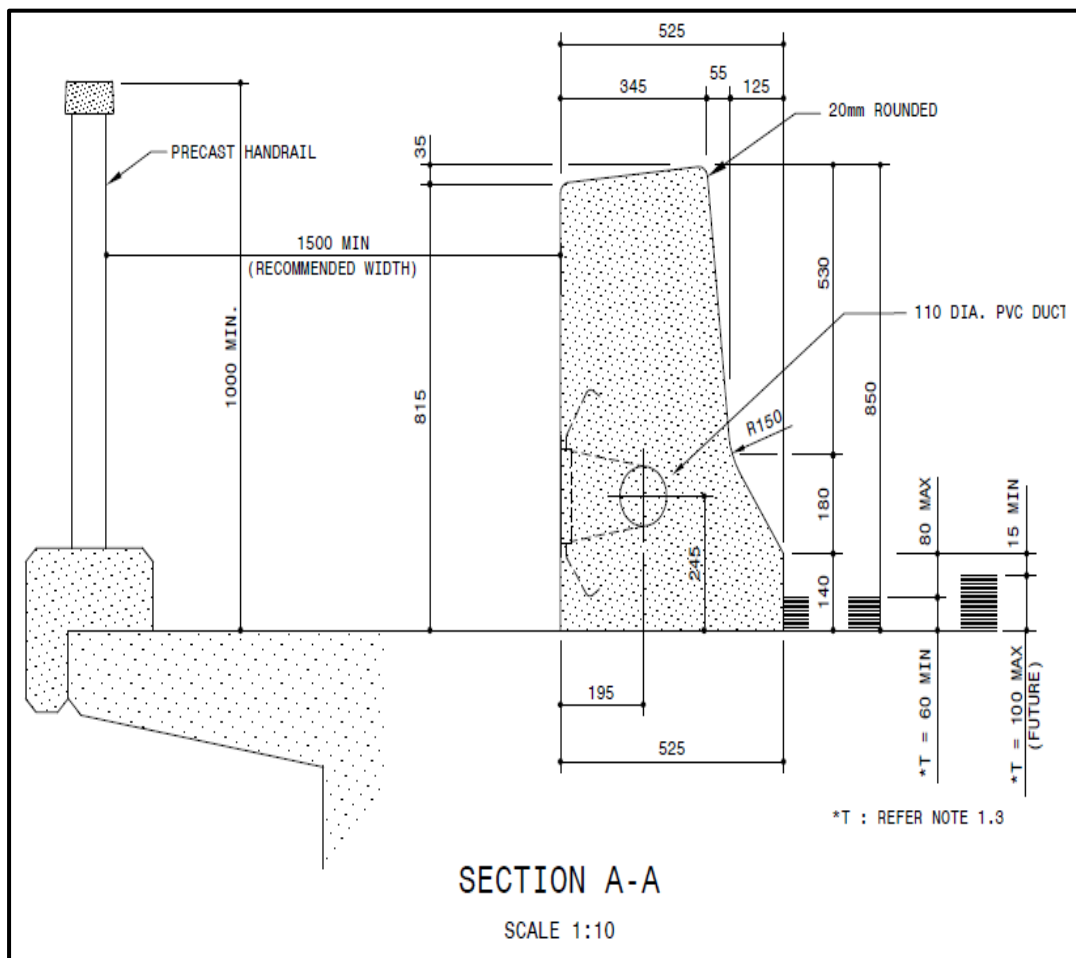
F-shaped Parapet for Use on Bridges with Separate Pedestrian Path
